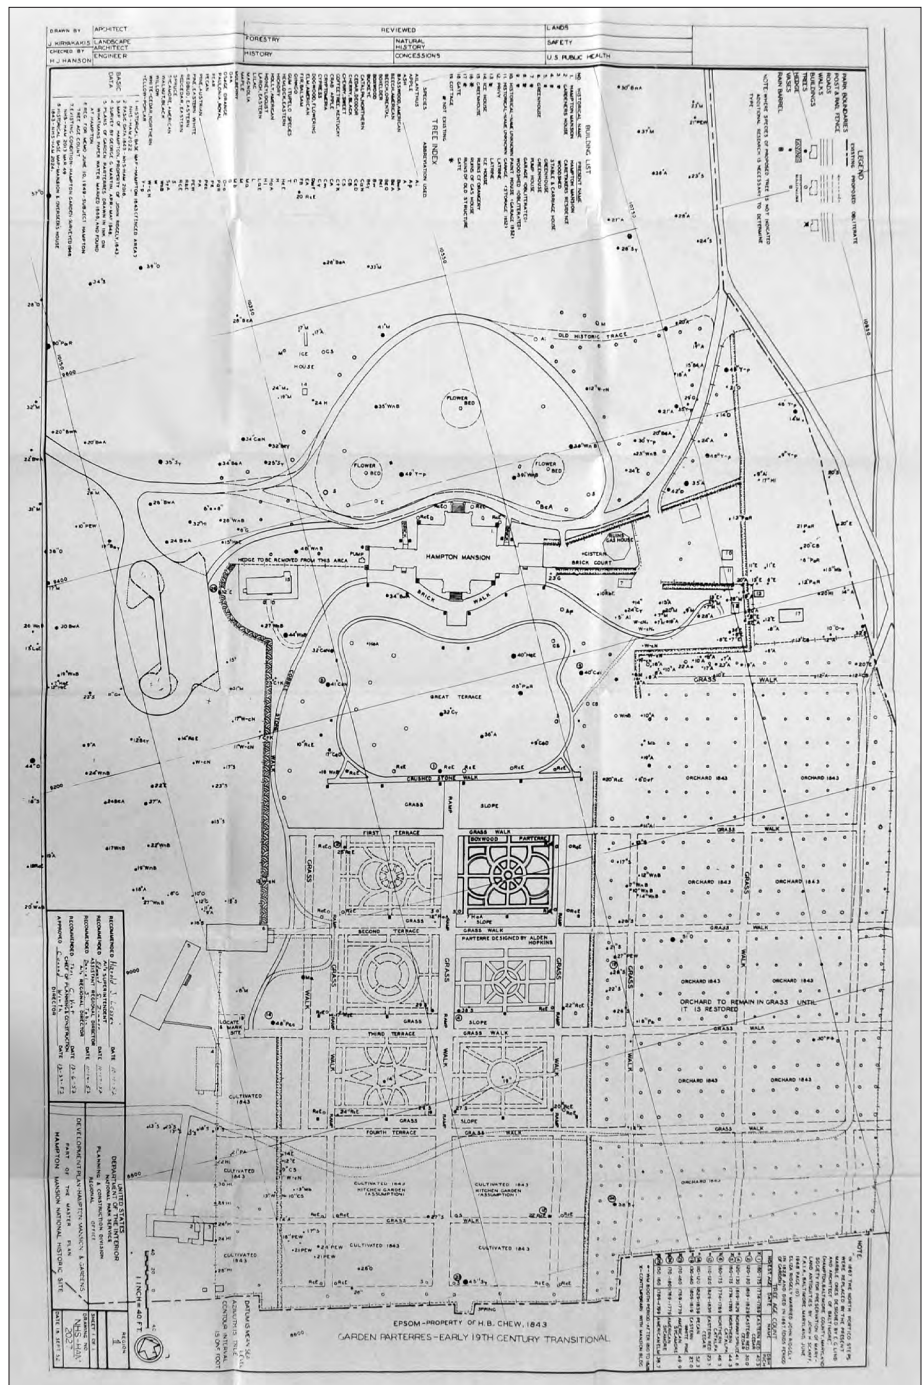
“Development Plan – Hampton Mansion & Gardens, Part of the Master Plan, Hampton National Historic Site.” Plan view, 1952 (HAMP).
